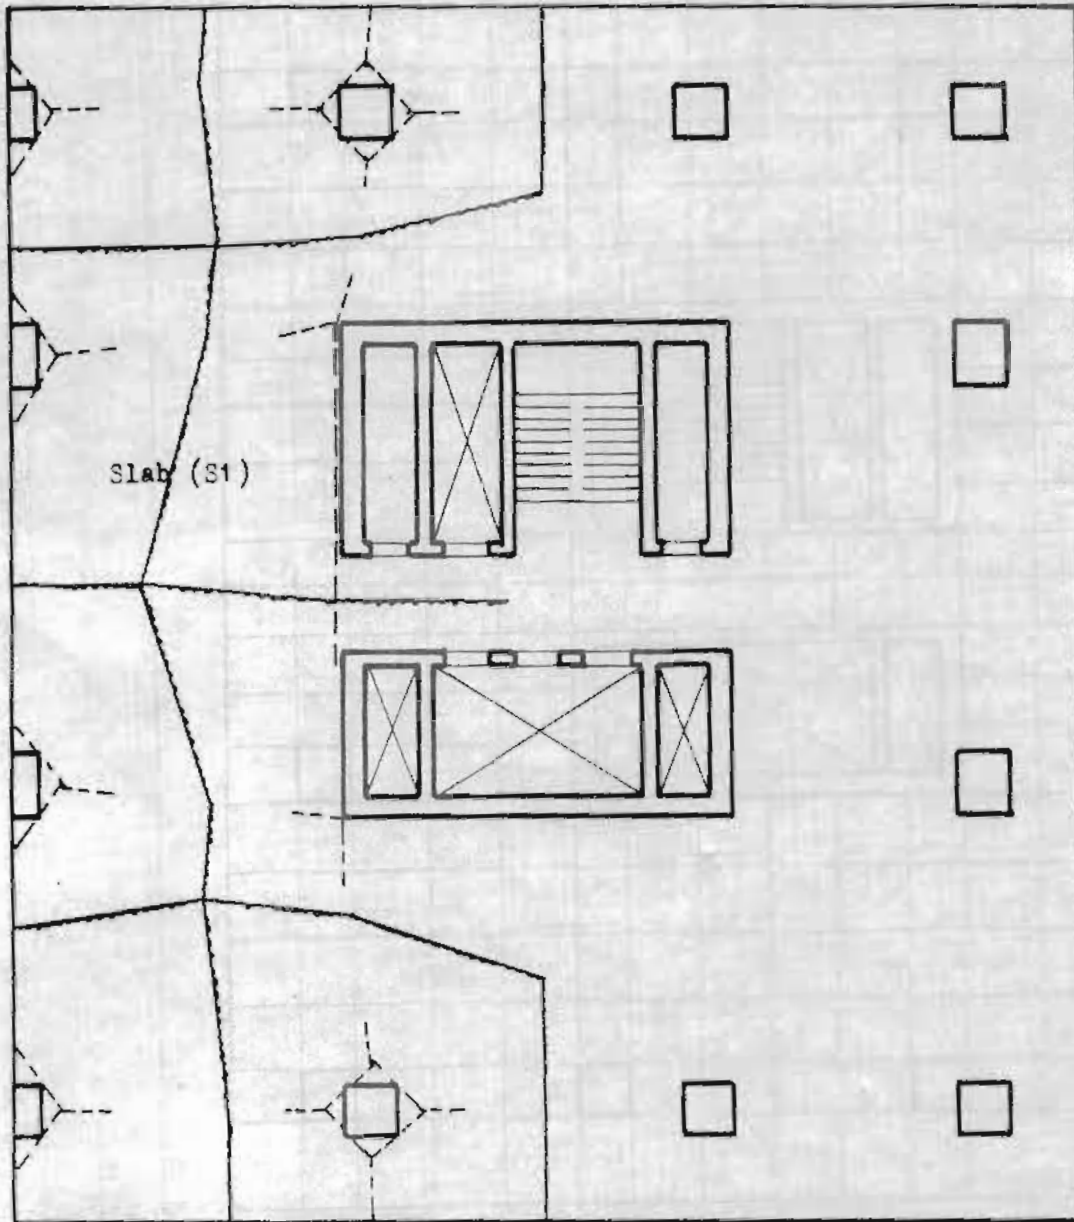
Plan Of The Typical Floor Showing The Assumed Crack Pattern
